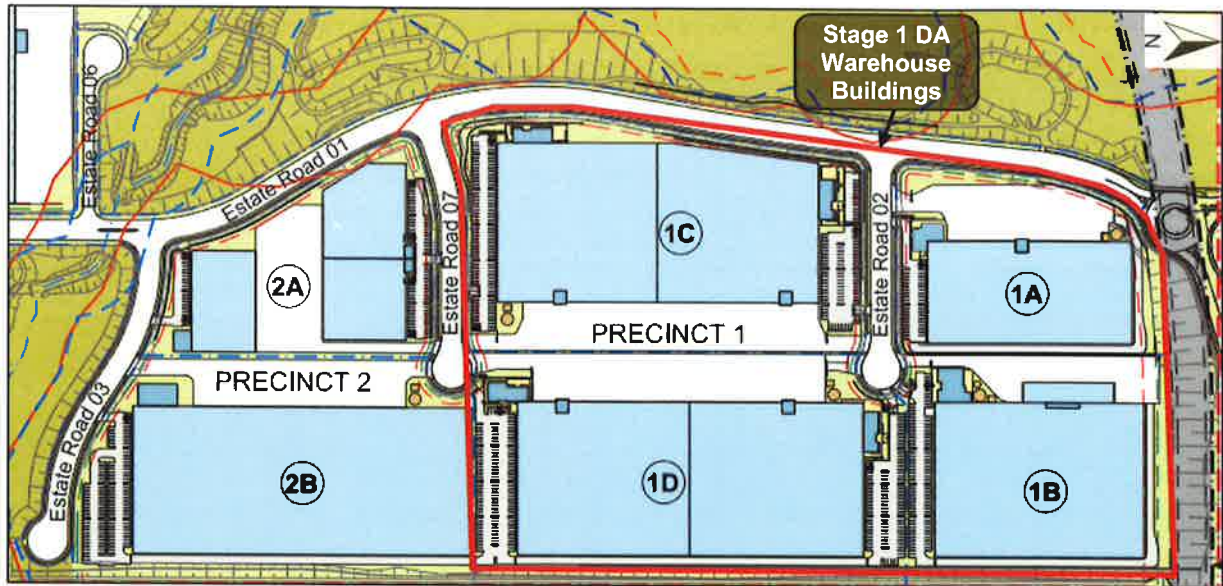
Proposed Precinct 1 and 2 Lot Layout
